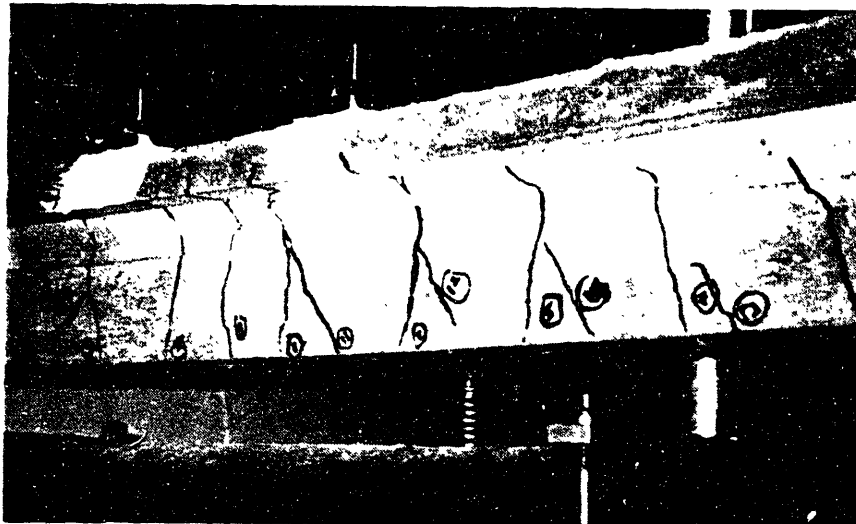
Extensive Cracking Before Failure of Phase I Test Beam
